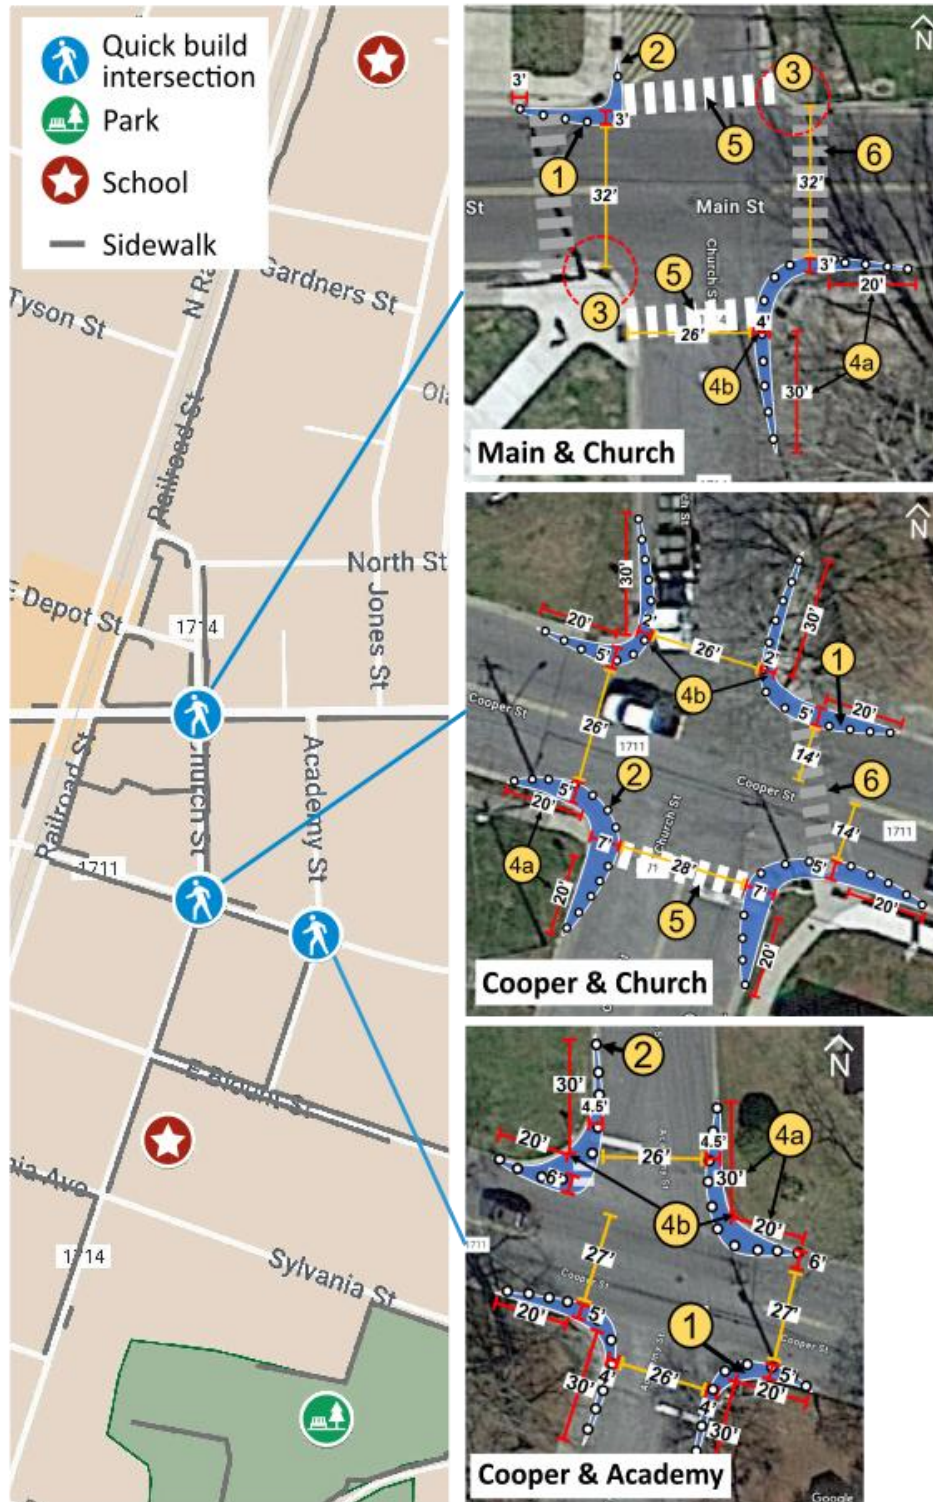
Engineering diagrams and locations for quick builds. 1 & 2: Curb extensions were constructed out of blue paint and white flexible delineator posts. 3: No curb extensions were constructed at two corners of Main/Church to allow for emergency vehicle access. 4a: Tapers were generally 20' along non-stop-controlled sides of intersections and 30' on stop-controlled sides. 4b: Curb extension widths varied to maximize impact while retaining 26' of roadway space. 5: Temporary high-visibility crosswalks were installed at stop-controlled sides of intersections. 6: Existing high-visibility crosswalks (installed January 2024).
